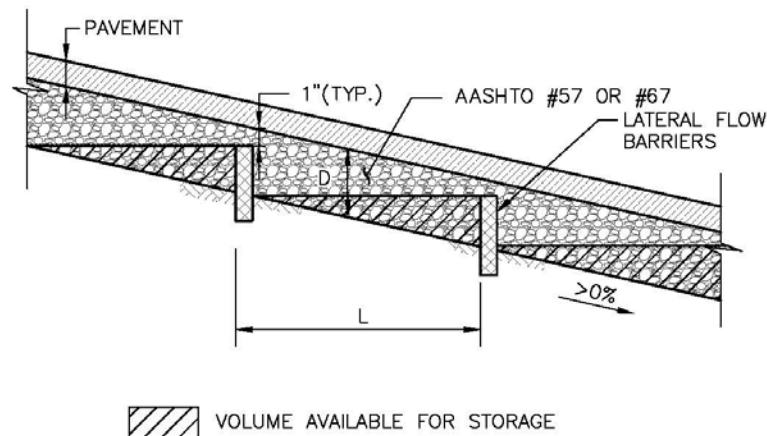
Permeable Pavement Profile, Sloped Installation.
